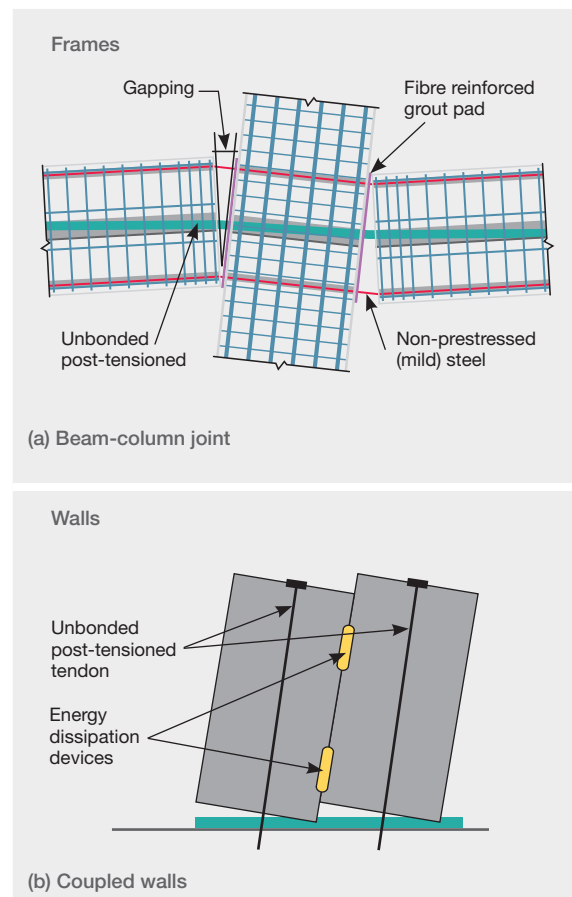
Jointed rocking frame and wall systems illustrating the mechanism developed (source: Buchanan report)
